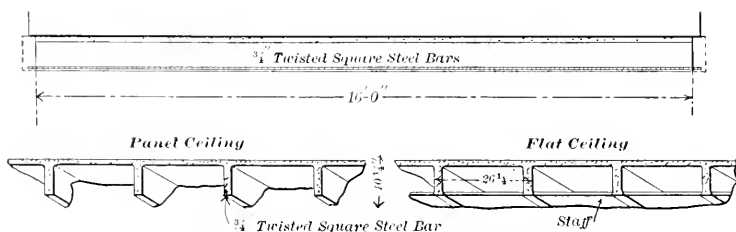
DESIGN FOR FIRE-PROOF FLOORS, RANSOME SYSTEM.
